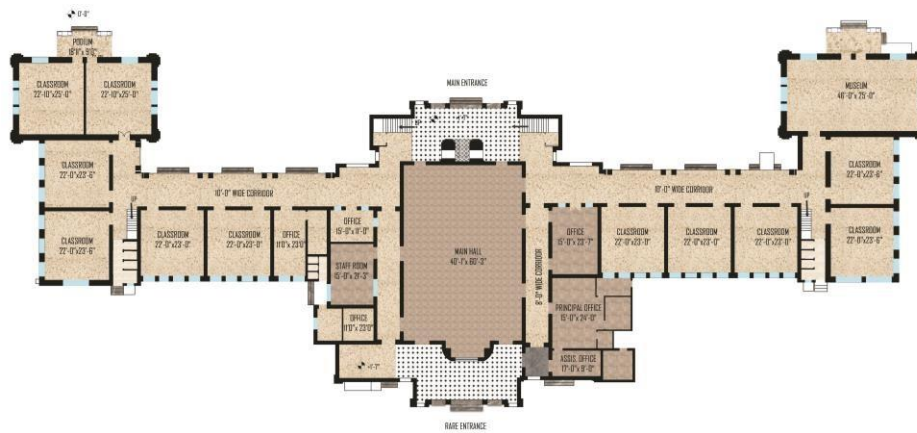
GROUND FLOOR PLAN OF GANGA RAM BUILDING
